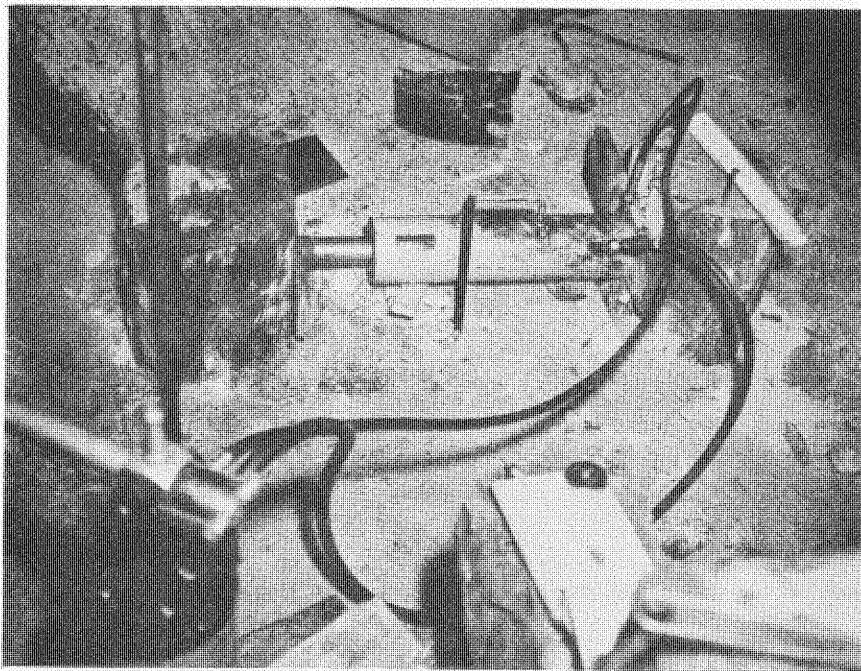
Closeup view of hydraulic jack used for testing piles No. 3 and 4 for horizontal movement with loading. Check tests were made at 2-1/2, 5, 7-1/2, and 10 tons. P783-908-454, November 26, 1951.
